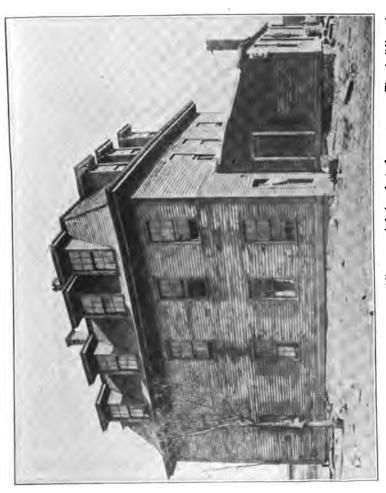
Illustration XIV.—Three story frame building occupied by forty-four persons. The building is structurally unsafe and without fire protection, plumbing or sewer connection. Between the time of first inspection and the time this view was taken the cornices had been patched, a trough taken in from a second story window, a new roof placed on the one-story addition, the basement boarded up and the front of the building painted.
